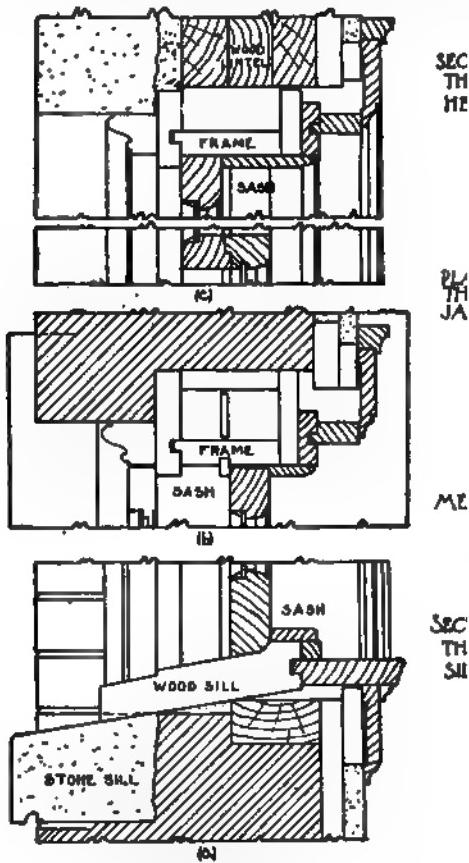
Typical Double-Hung Window-Frame for Brick Walls. *a.* Sill. *b.* Jamb. *c.* Head.
